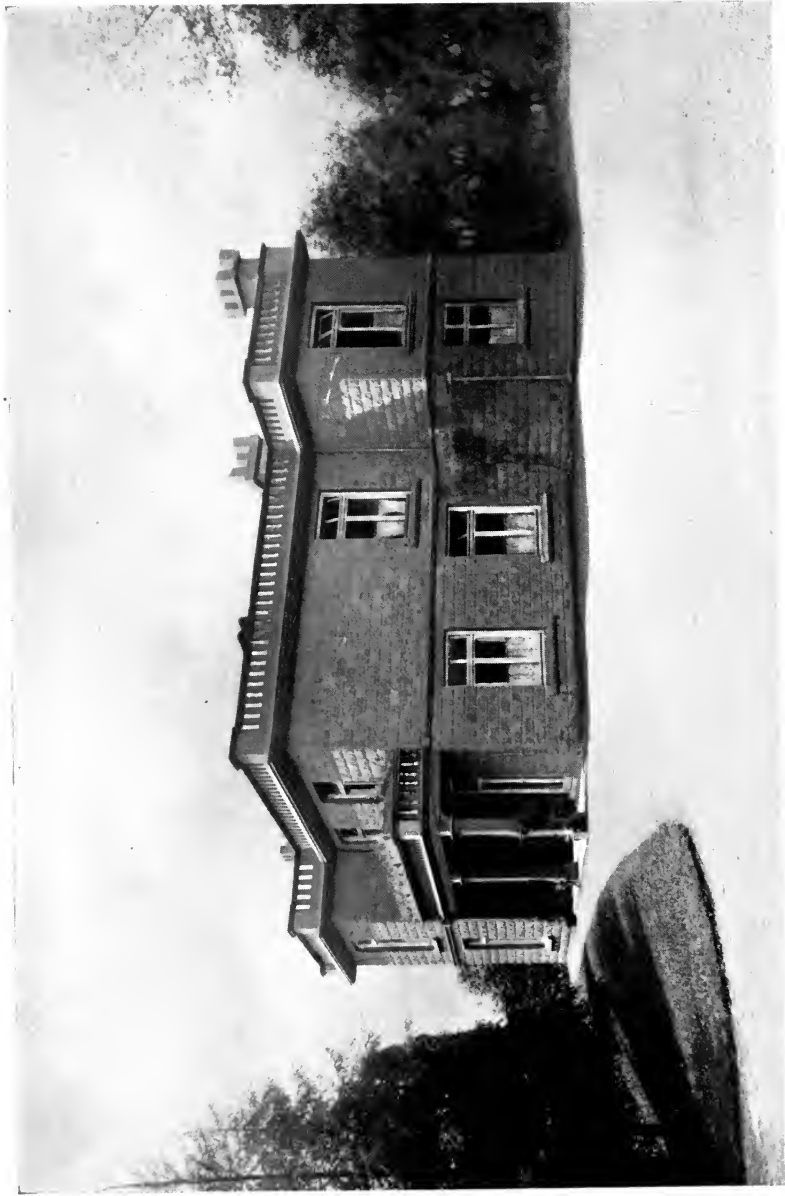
House constructed of concrete blocks, floors and roof reinforced by expanded metal, with spans up to 15 feet. Inside walls solid concrete. Designed and built, in 1906, by F. Ballard and T. Armstrong.
